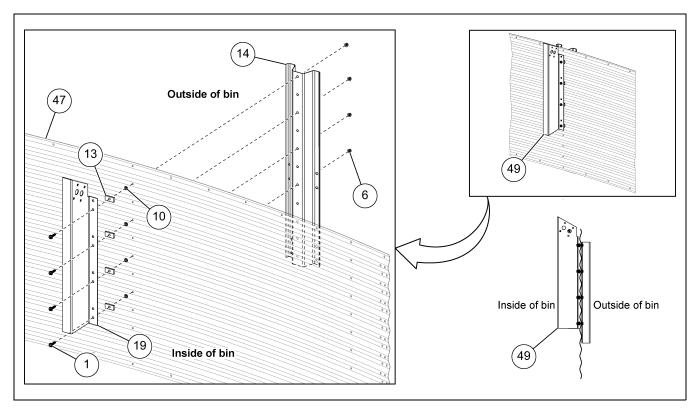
B Installing the Roof Rafter Bracket to the Top Outside Stiffener (FC Stiffened Bins) - 4.00"
